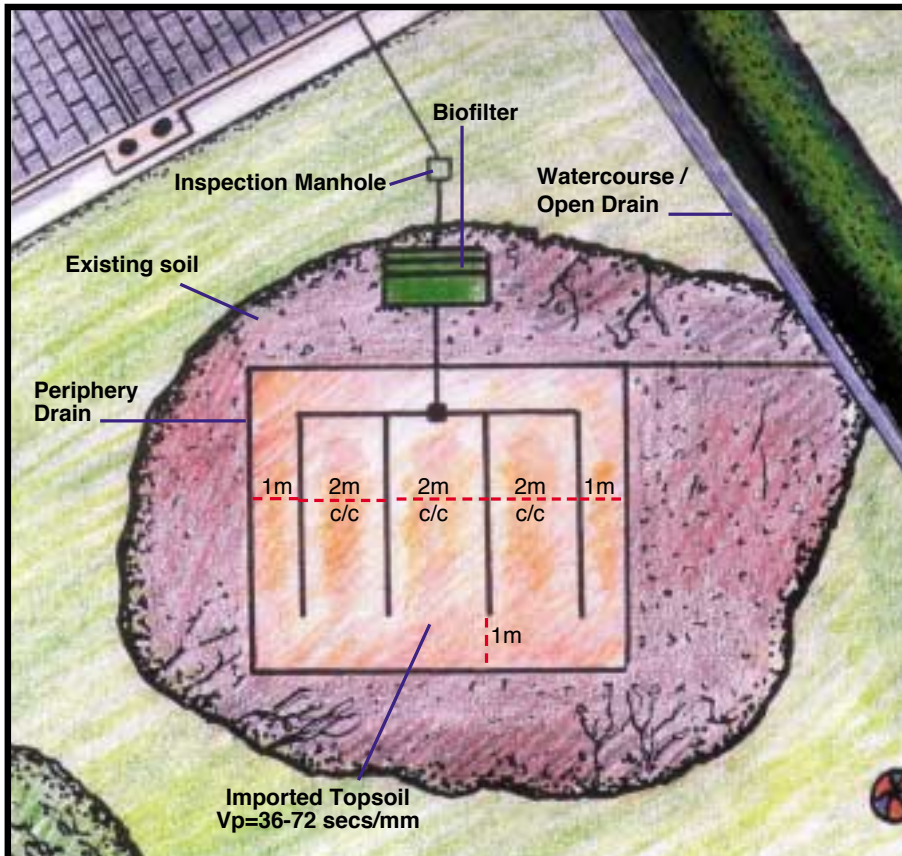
Typical layout of Biofilter & Sub-surface Percolation Area with peripheral drains for sites with impervious soil and access to a watercourse / open drain.
